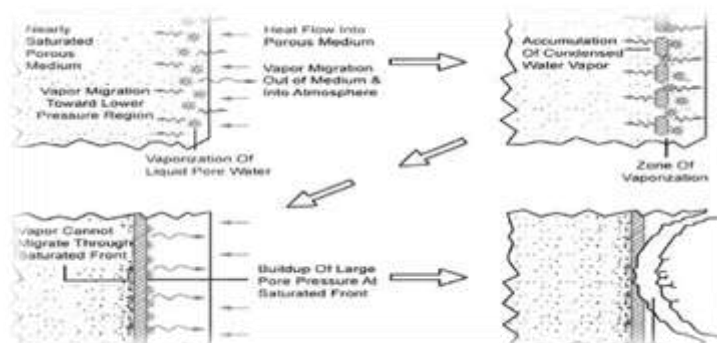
The Spalling mechanism of concrete covers [1].
